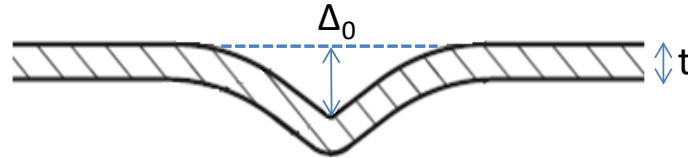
Buckling shape and location of a tube with girth-weld misalignment.
